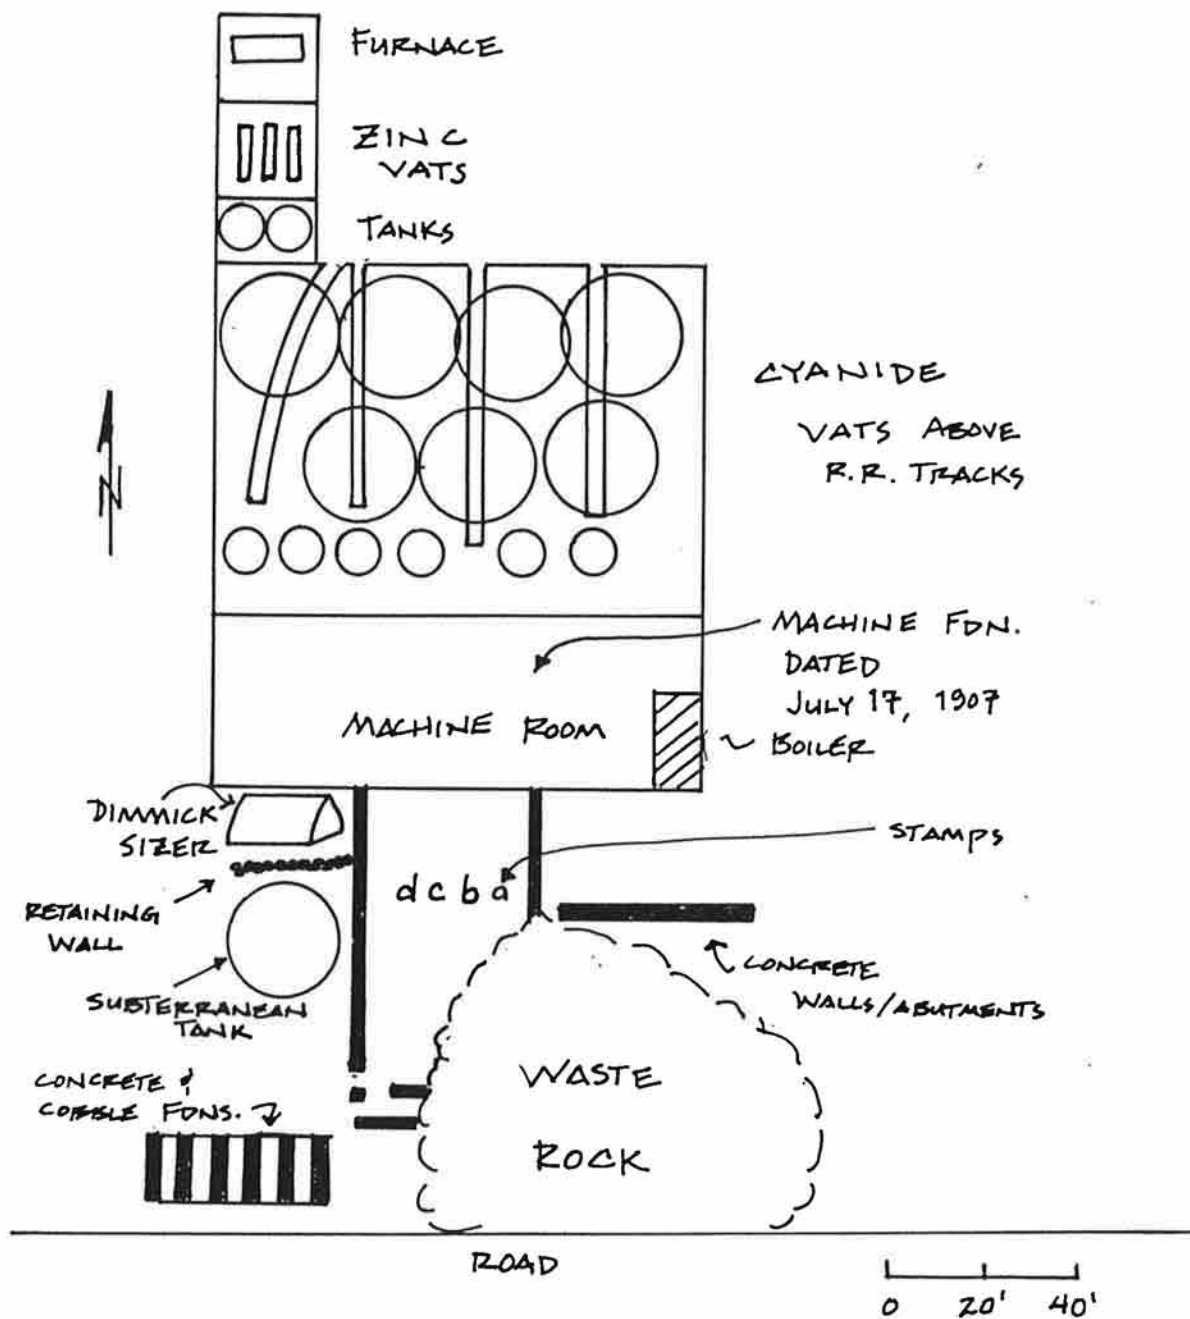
Karma site, plan of extant mill foundations. a - d = stamps and batterries.
